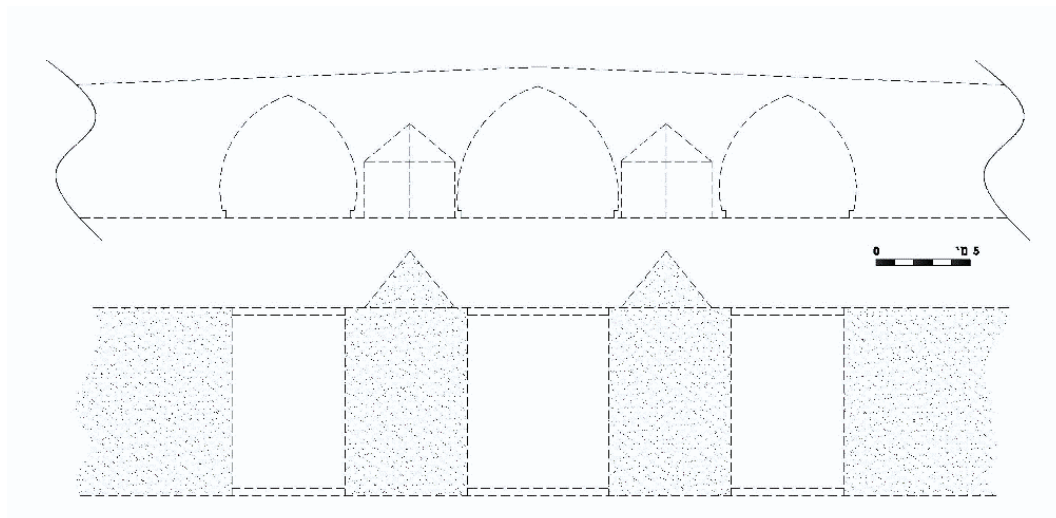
Schematic plan and section of Banāt Ya'qūb Bridge by Dror Czitron and Erez Mizrachi.
